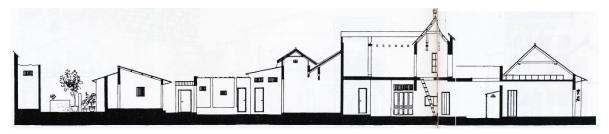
Section, Hang Can street Source: IledeFrance & HPC, 2003
